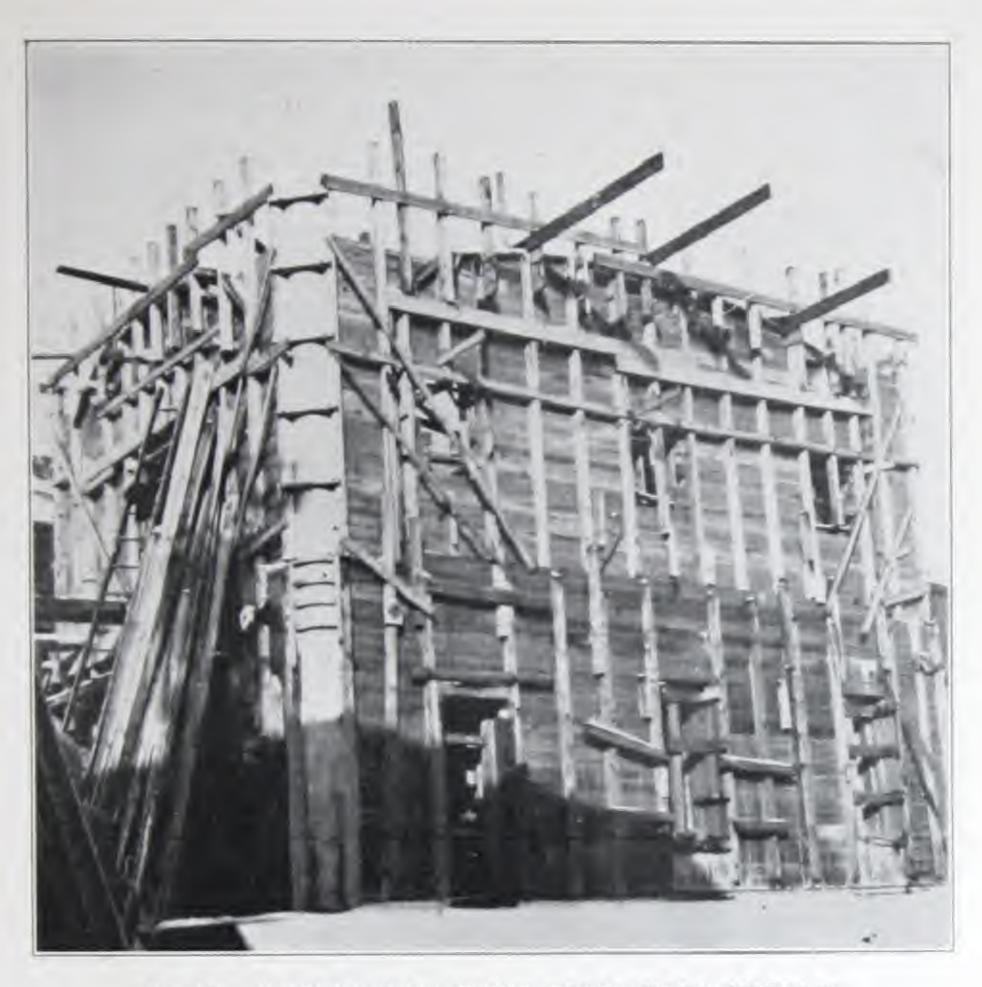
WOODEN WALL PANEL FORMS HELD BY BOLTS.
